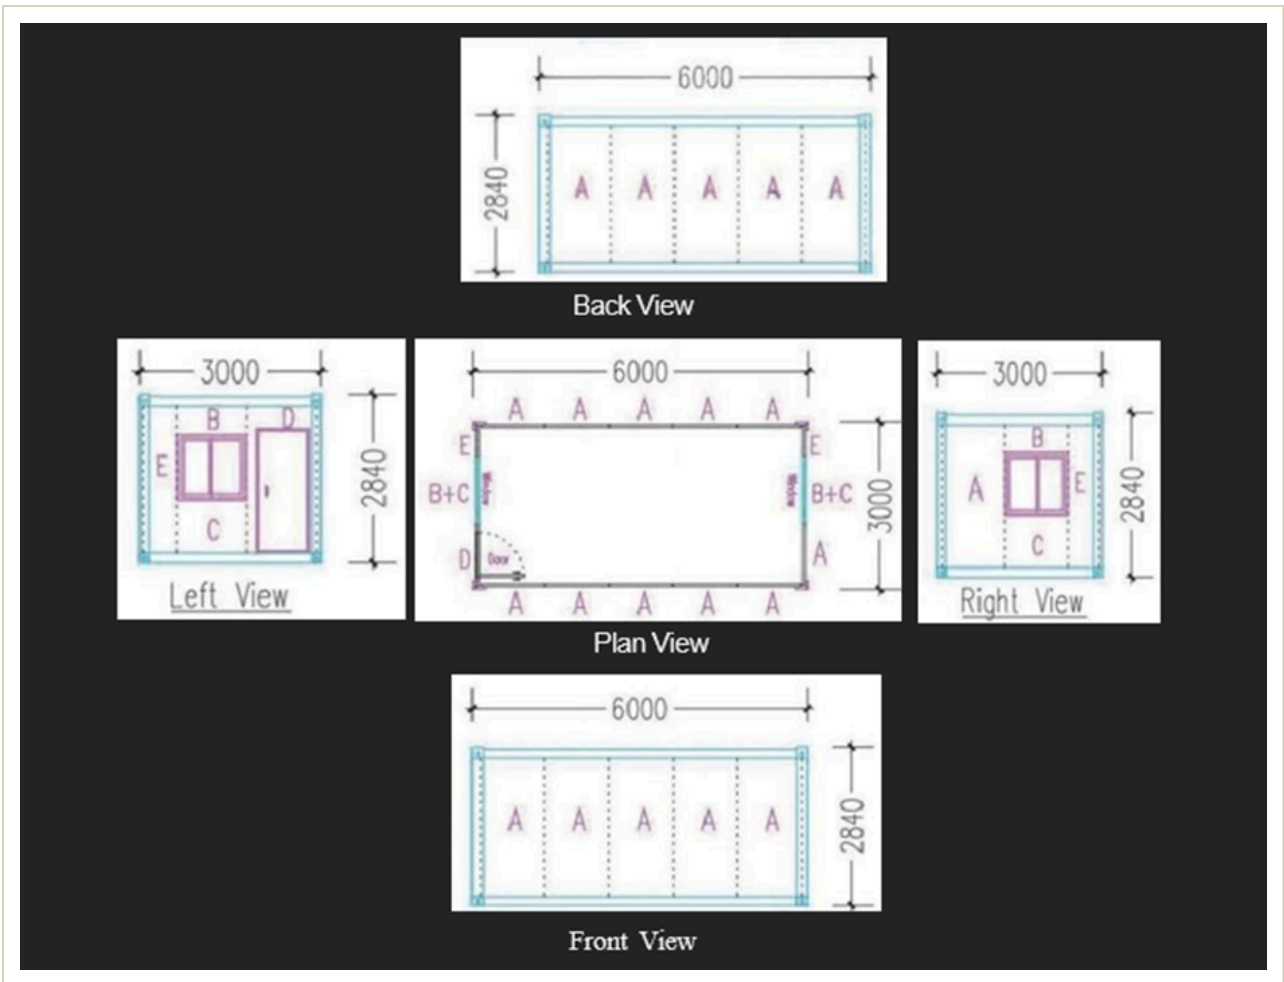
Example panel layout — plan, front, back, left and right elevations showing A / B / C / D / E panel positions.
